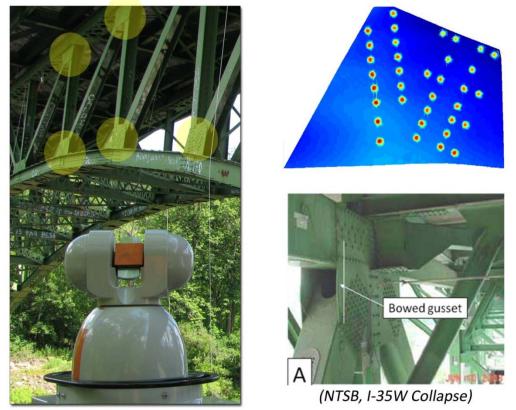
BRIDGE RLS gusset plate assessment, buckling failure of the I-35 W bridge in Minneapolis, MN (lower right).
